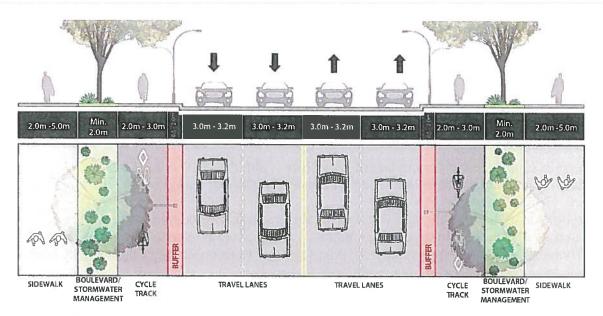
Mid-Term Shelbourne Street Right-of-Way
